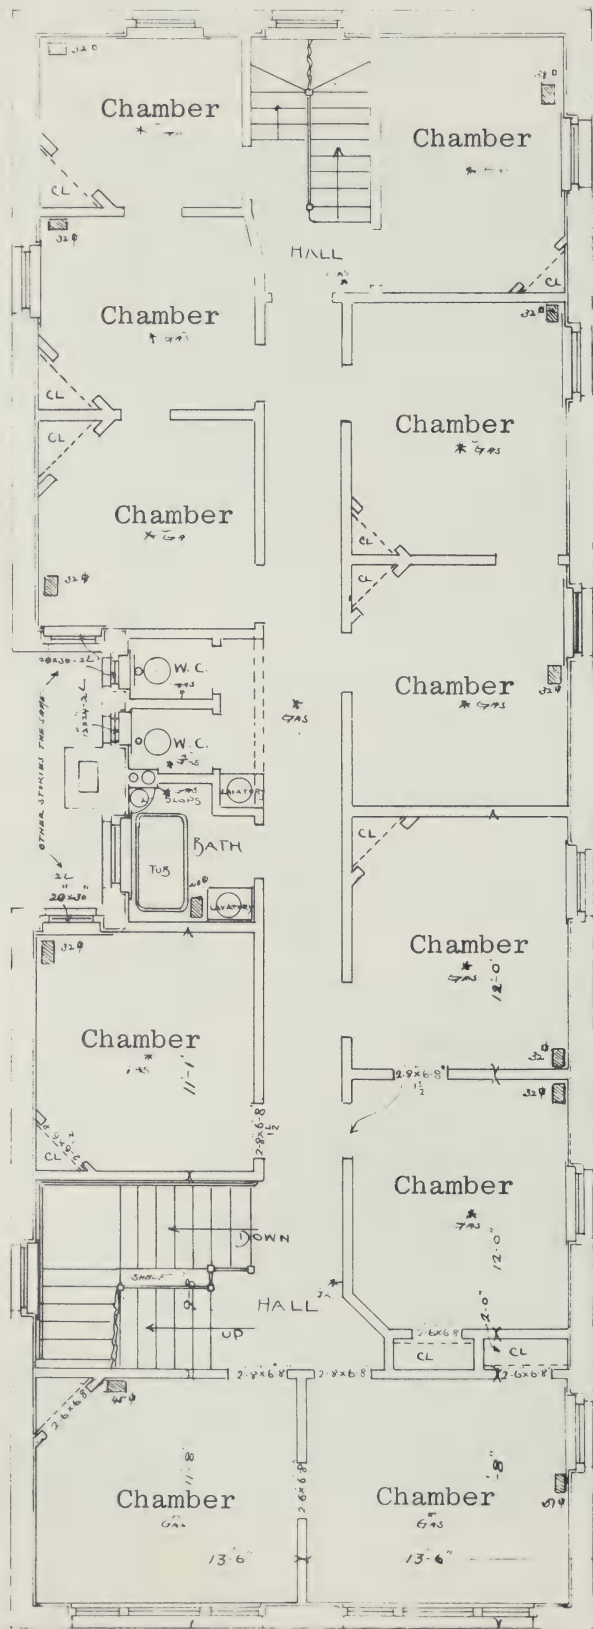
Plan for the second floor of a lodging house on Oxford Street built in 1909. *Plan courtesy of the Building Department of the City of Lynn.
